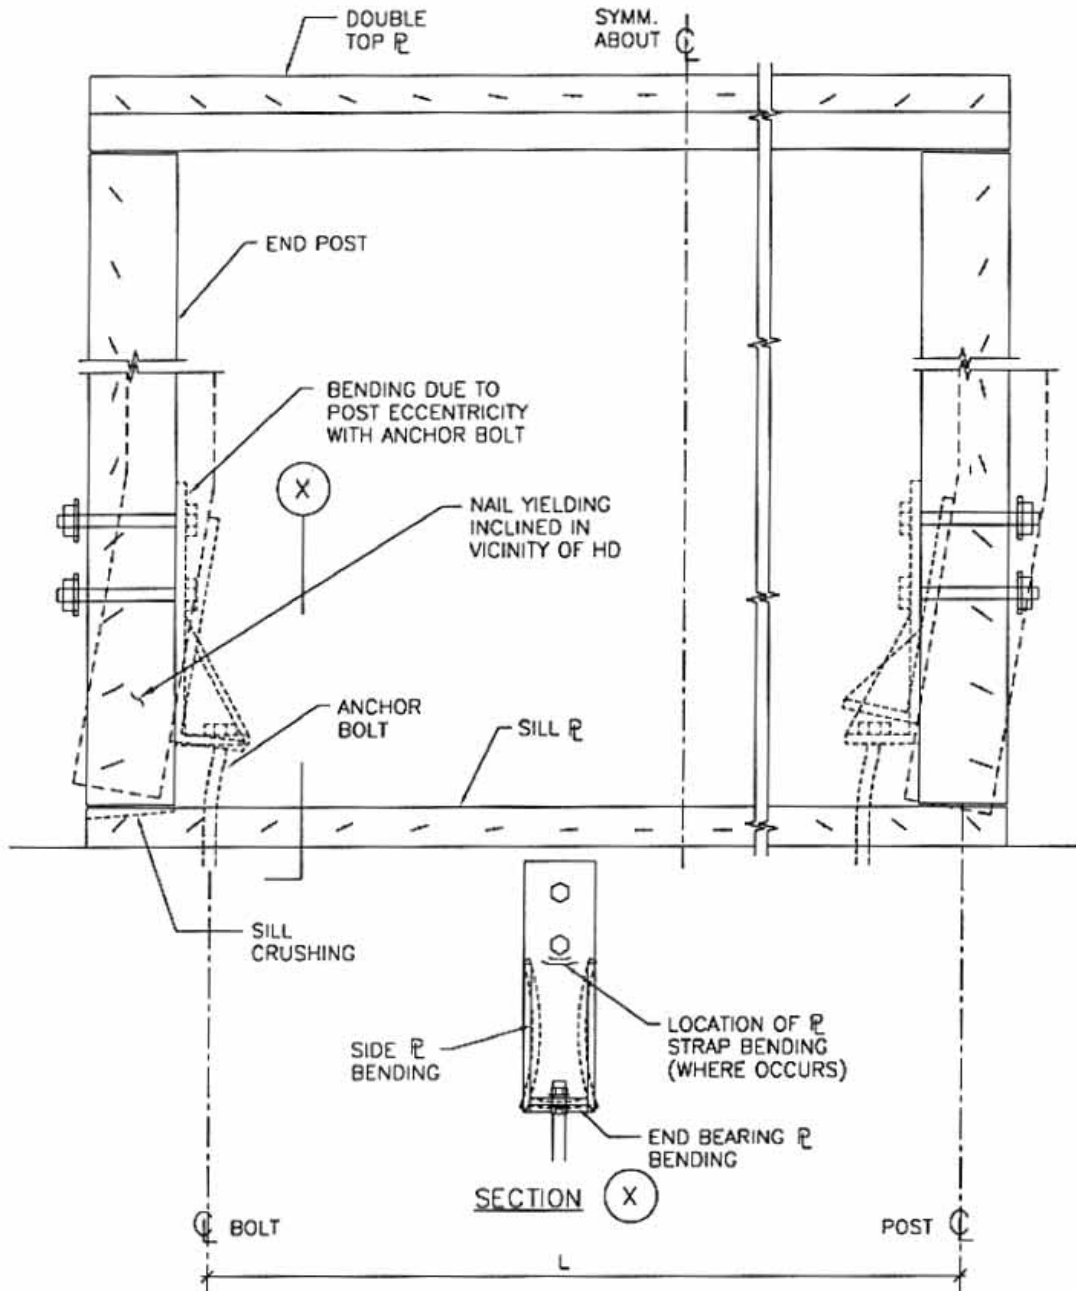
Schematic of Typical Nail Holding Patterns Observed in Panel Framing
